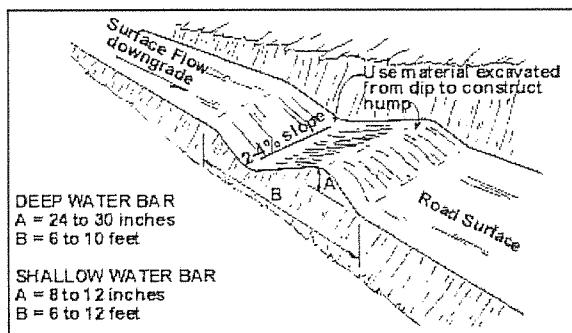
Water bars are narrow structures that may be shallow or deep. Deep water bars are usually used on roads that will be closed for extended periods (USFS).
